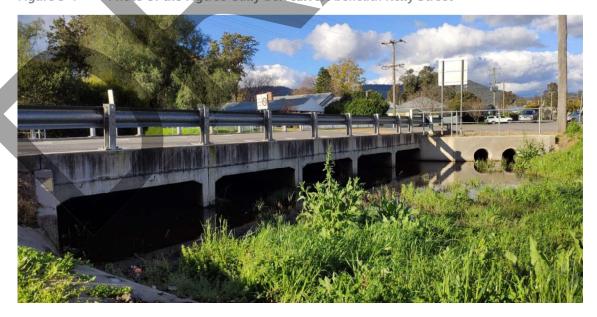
Photo of the Figtree Gully culverts beneath Kingdon Street
